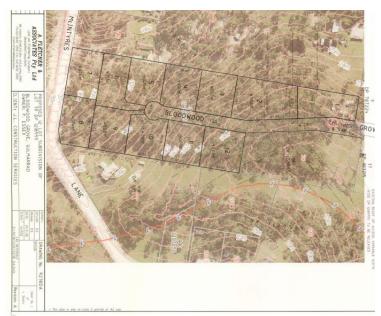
Proposed subdivision layout for 12 lots as submitted with the application
